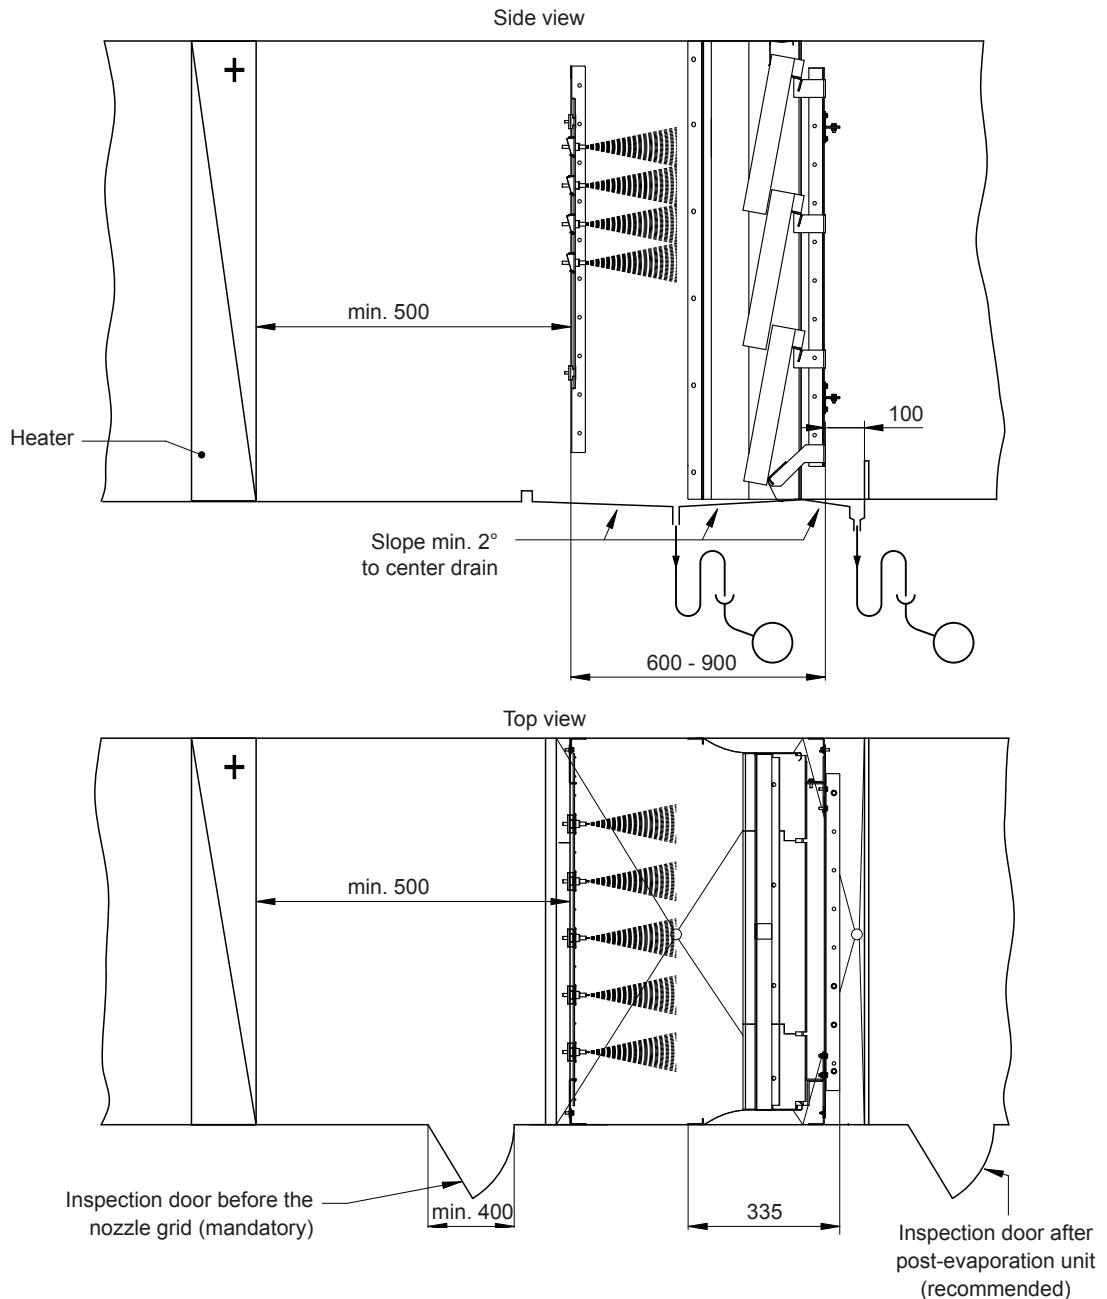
Positioning of the humidification unit with inspection door before and after the humidification unit - dimensions in mm
